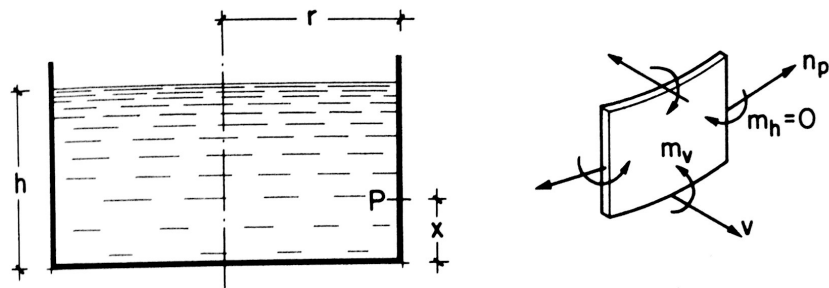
Efforts generated in the walls of a cylindrical tank. (Hormigón Armado)
